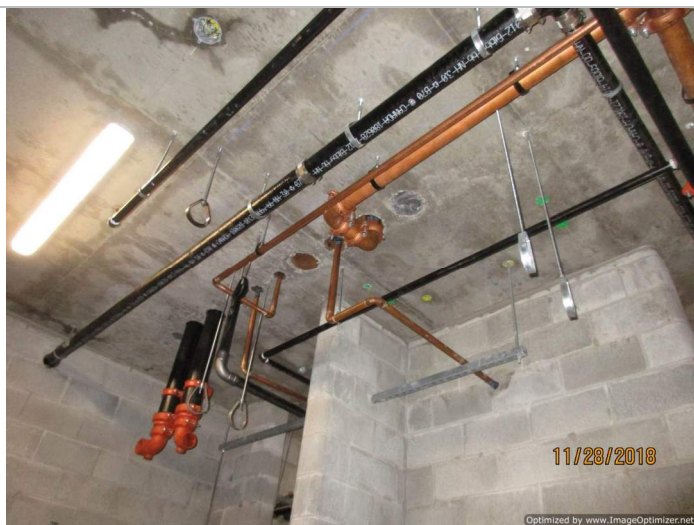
Piping risers from changeroom up to second floor mechanical room above
